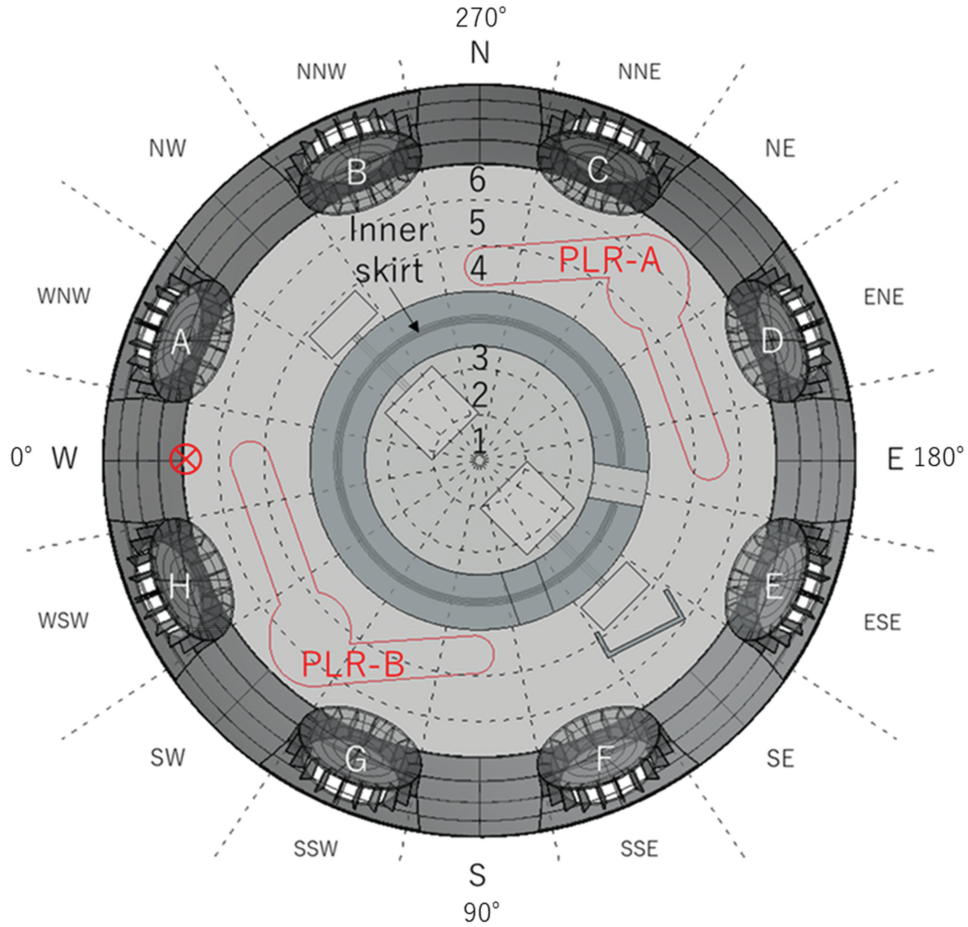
Plane view of the D/W floor; cardinal directions and radial sections 1 through 6 used to indicate areas captured in the following figures; pedestal wall between sections 3 and 4; D/W floor pedestal opening in E-ESE direction; upper floor CRD exchange opening in SSE section. Red-colored lines denote outline of the PLR piping; rectangles in and outside of the pedestal area denote sump pits; white letters A through H denote jet deflectors; gray structure at SE-5 indicates shielding block; red circled X mark denotes ROV insertion point.
